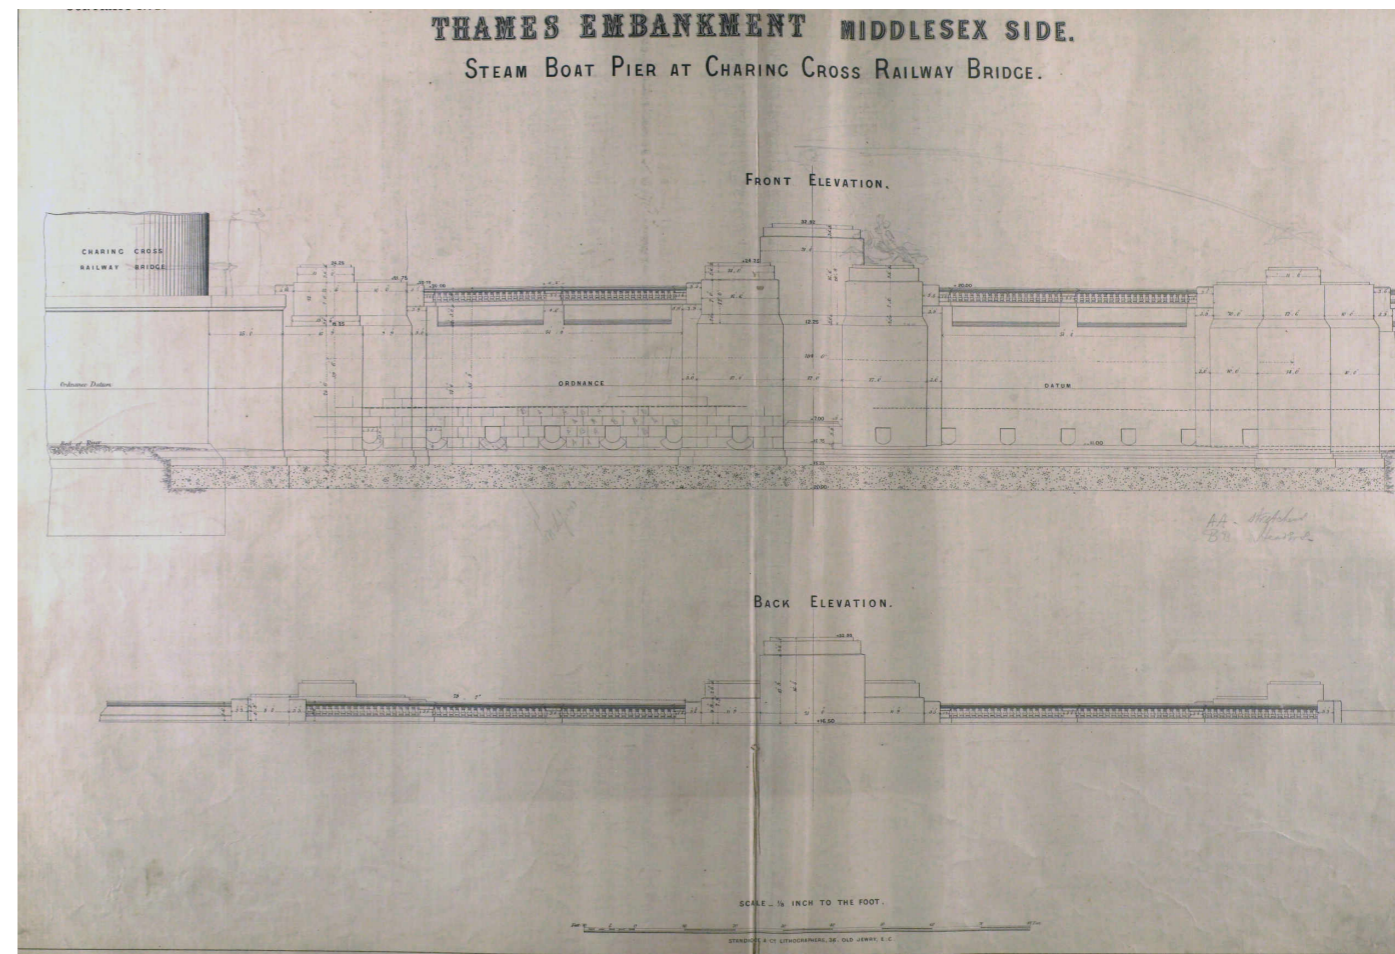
Original Thames Embankment detail drawings (not to scale)
